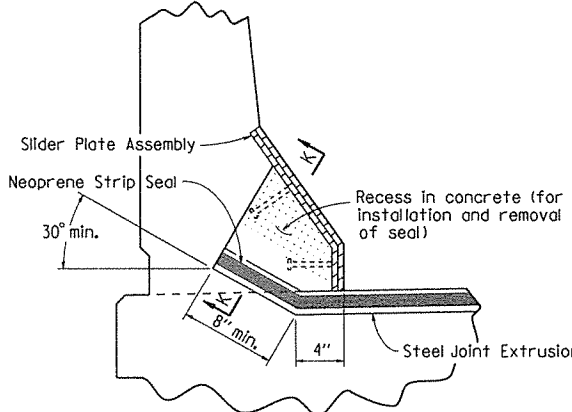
DETAIL OF NEOPRENE STRIP SEAL AT CURB
